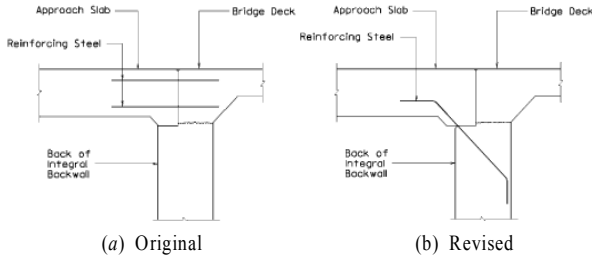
Approach Slab Connection Detail of VDOT Standard
